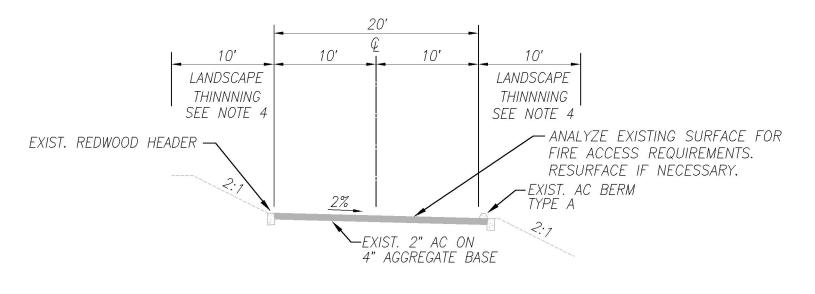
Southeast Roundabout The Junipers Fire Protection Plan
